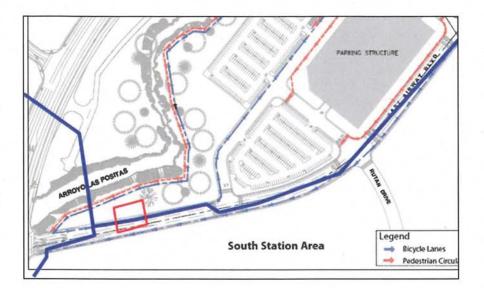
The blue line denotes a Zone 7 pipeline and the red rectangle denotes a pumping facility.
